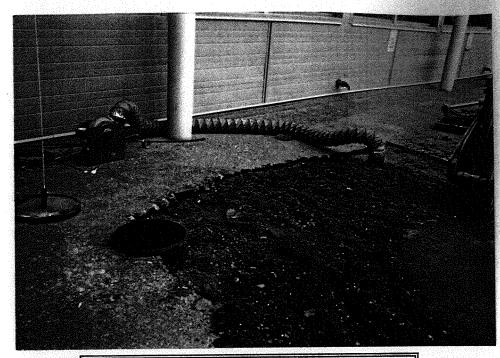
City of Fairbanks Department of Public Works used oil tank, prior to excavating, looking northwest.
